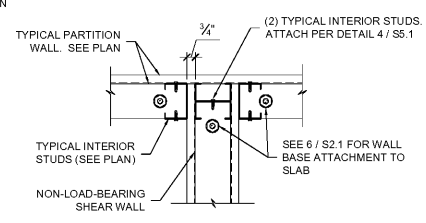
B OF SHEAR WALL PANEL WITH STRAP BRACING
